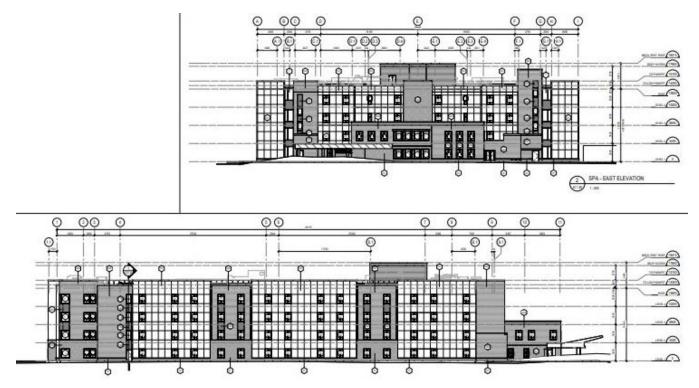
Front (top) and Corner Side (bottom) Building Elevations.
